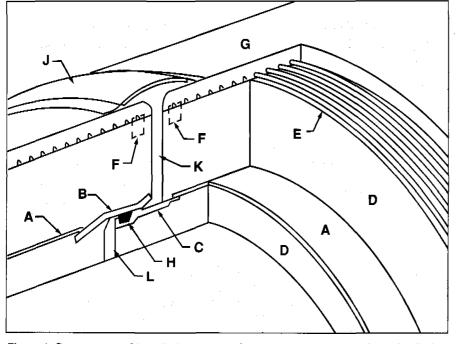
Components of installed prestressed concrete cylinder pipe: A steel cylinder (A) with steel bell and spigot joint rings (B) and (C) welded at the ends is embedded in the high-strength concrete core (D). High-tensile prestressing wire (E) is helically wrapped around the core and secured at each end by anchors (F) embedded in the concrete. A dense cement mortar coating (G) encases the wrapped core. A round rubber gasket (H) is placed in an annular groove in the spigot ring just prior to field assembly. A grout band (J), wrapped around the joint and firmly strapped on both sides after field assembly, serves as a mold for cement-mortar grout (K) poured in the exterior joint space. The interior joint space is pointed with cement mortar (L). properties of the cement mortar.
